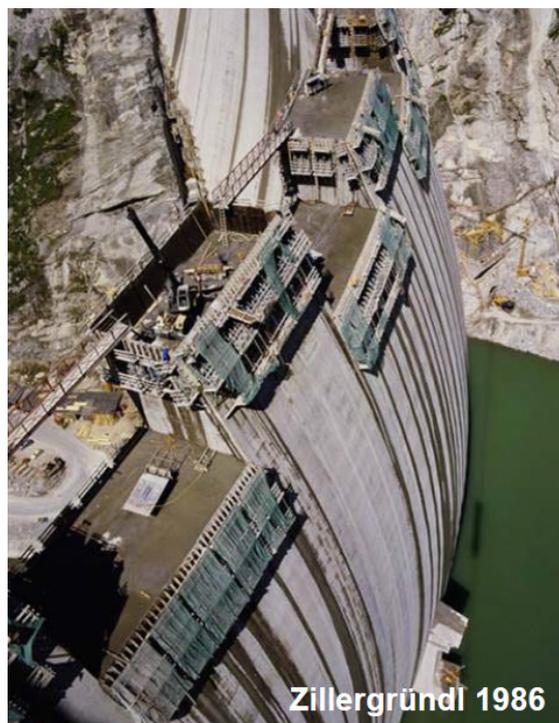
High-low block method used to build Zillergründl arch dam.
